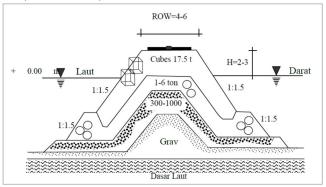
Cross-section View of Break Water (Spatial Plan of Banda Aceh 2009-2029)
